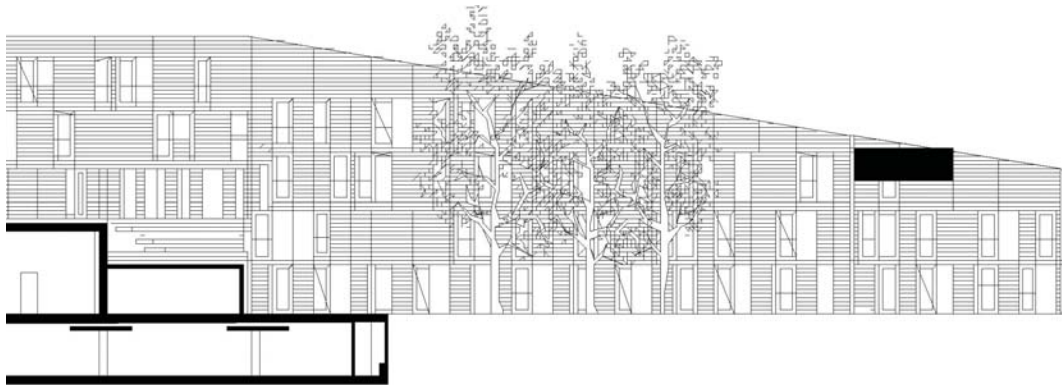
East -West courtyard section of Schots 2, looking north
